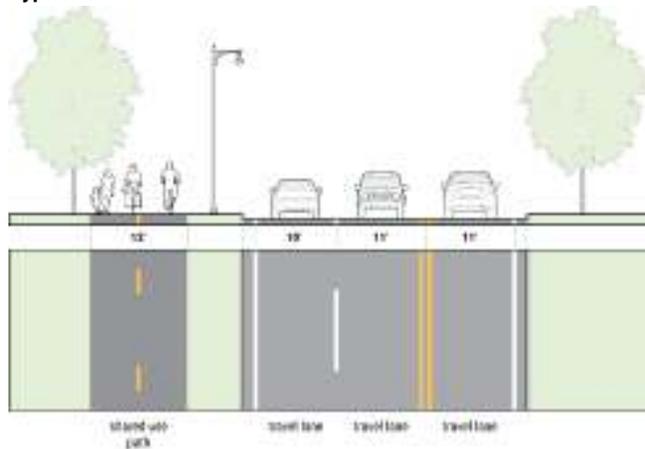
Hammond Pond Parkway Segment 1B Long-term Typical Cross Section
